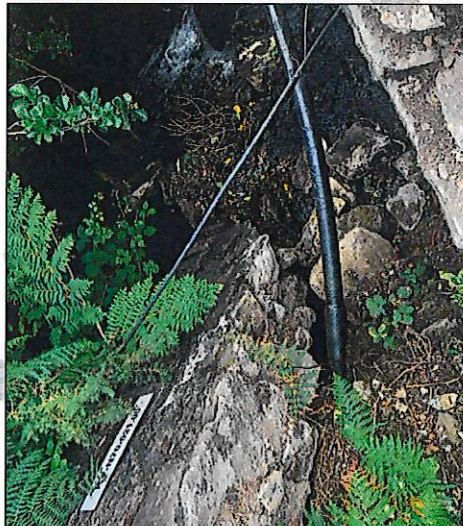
Damage to parapet wall on northern side of the N70.
